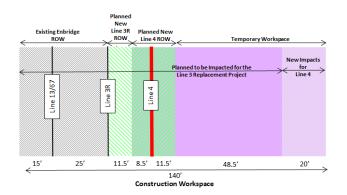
Line 4 Wetland Construction Workspace New Existing Enbridge Line 3R Planned New Temporary Workspace ROW ROW Line 4 ROW Planned to be Impacted New Impacts for the Line 3 Line 4 Line 15' 25' 11.5' 8.5' 11.5' 23.5' 20'
